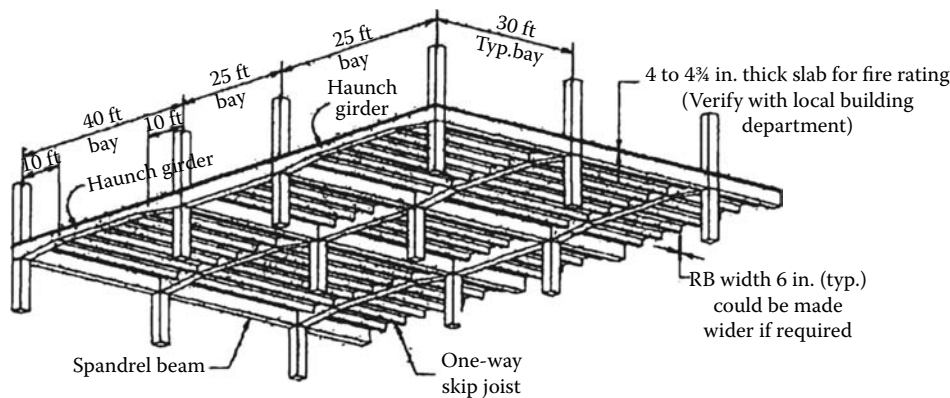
One-way joist system 30 ft × 40 ft bays.
